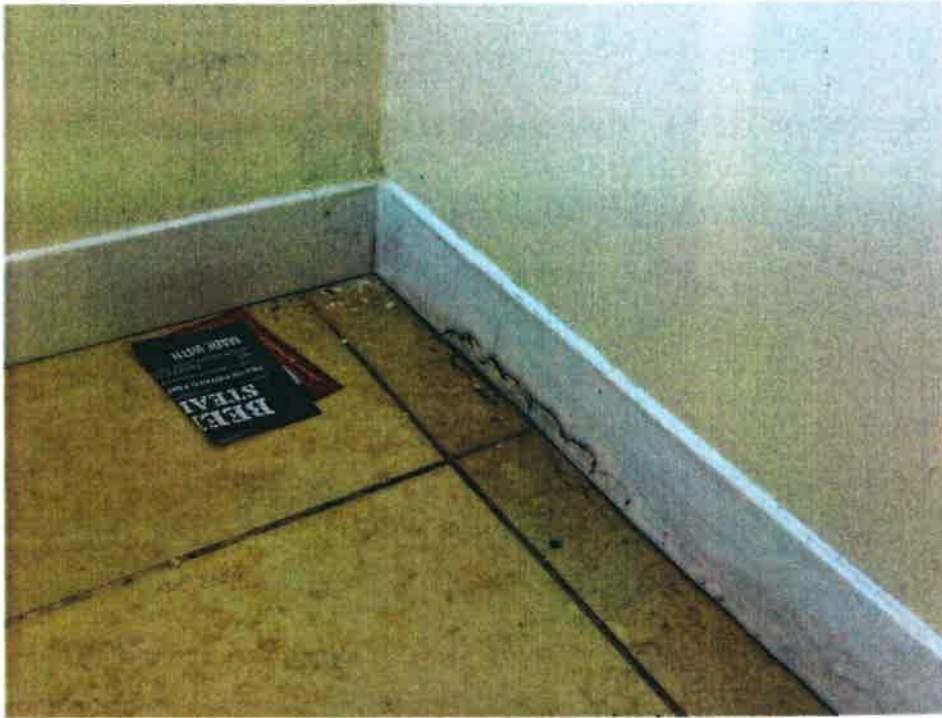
Damp staining to internal hallway (shower other side of wall)
